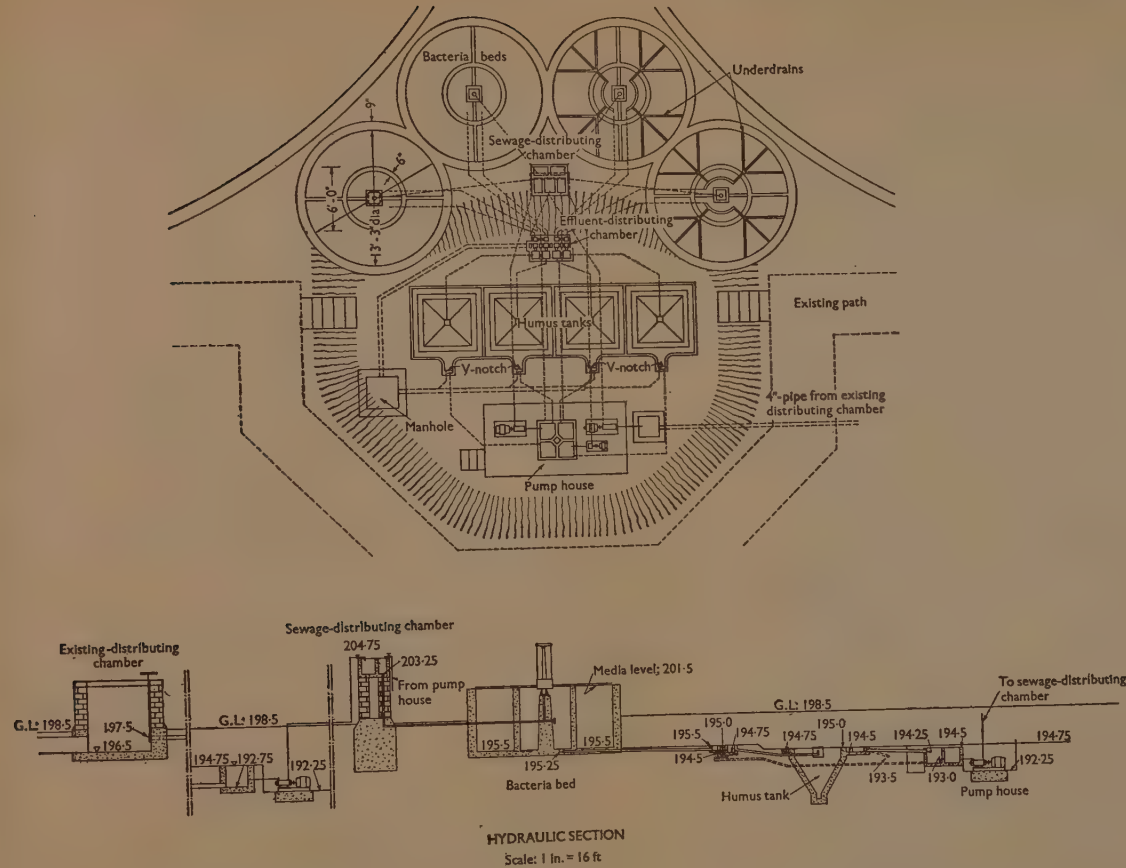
GENERAL LAYOUT OF FINHAM WORKS
